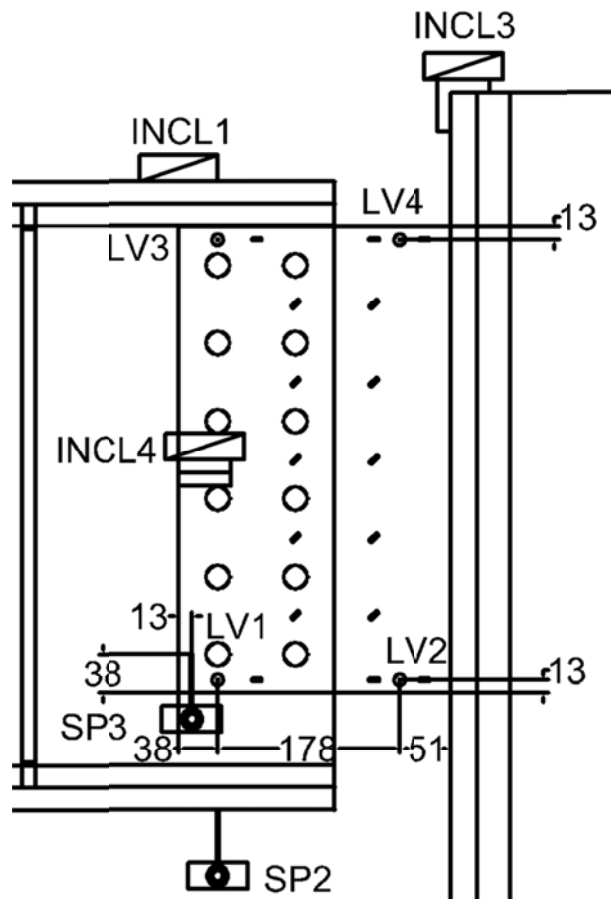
Out of Plane LVDT Layout, Configuration 4
